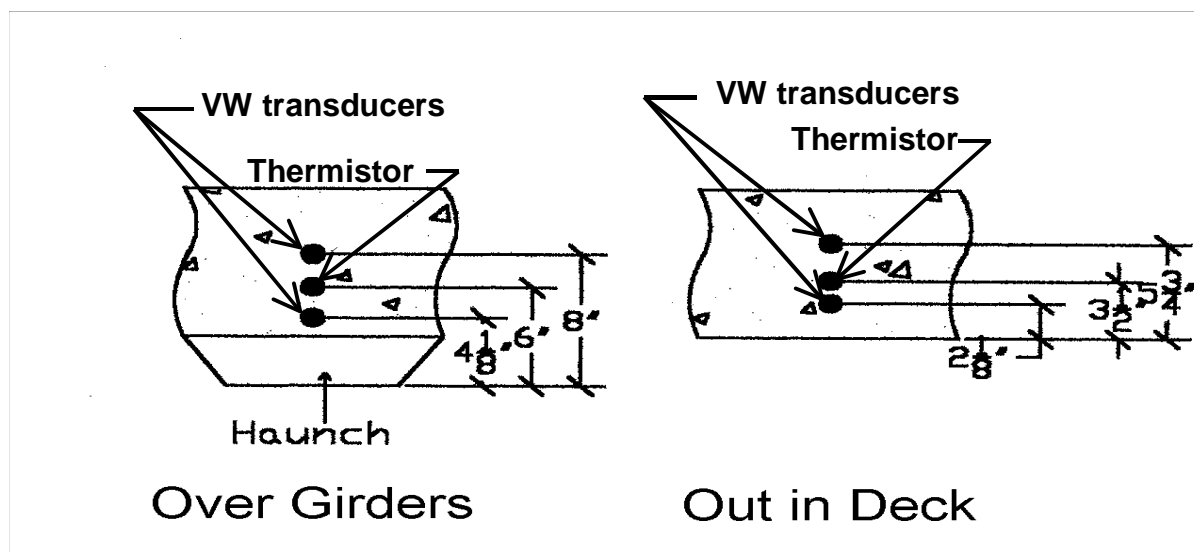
Typical sections in the deck illustrating the instrumentation details.
